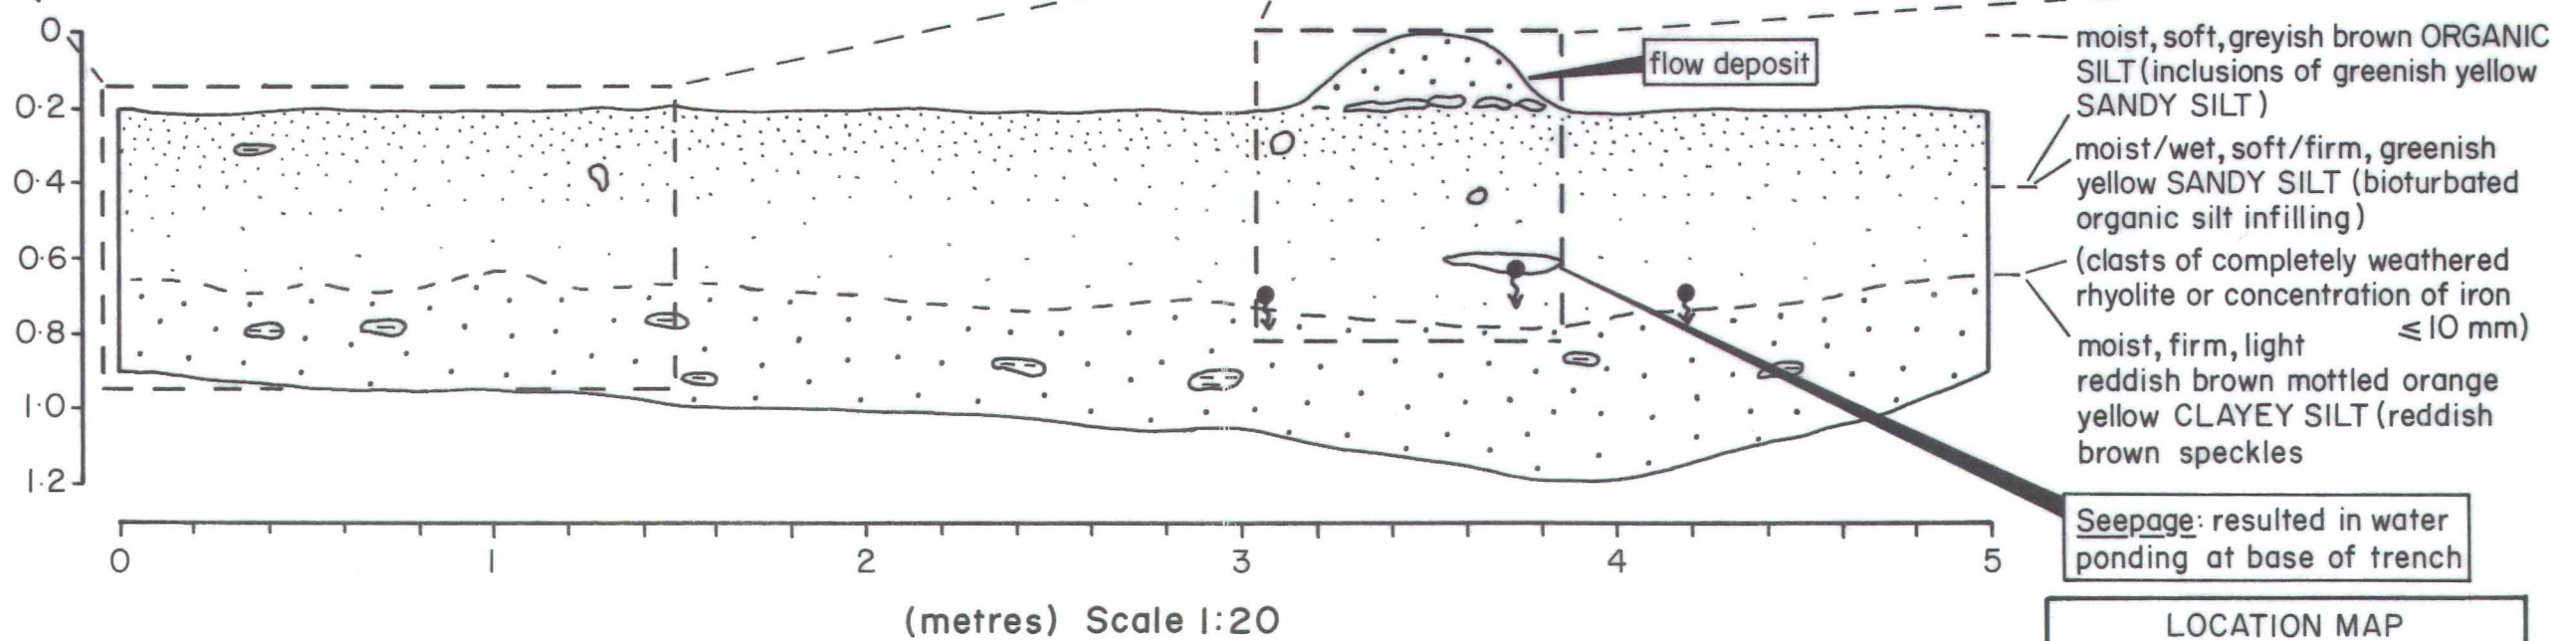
Trench 5: Upslope face, facing southeast, date logged 26/7/89
